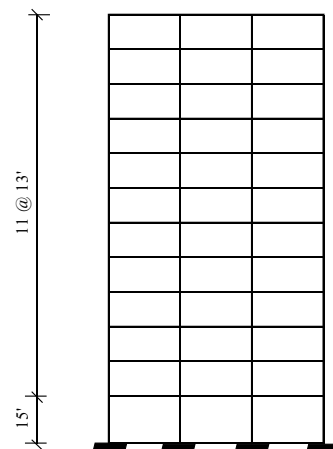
Baseline RC moment frame building typical 12-story elevation.
